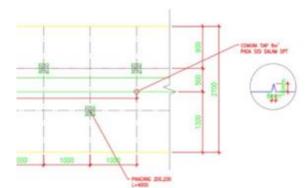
Section of the Mini Pile Pile Point Plan - Top View of Retaining Wall Source : PT. Permata Anugerah Yalapersada
